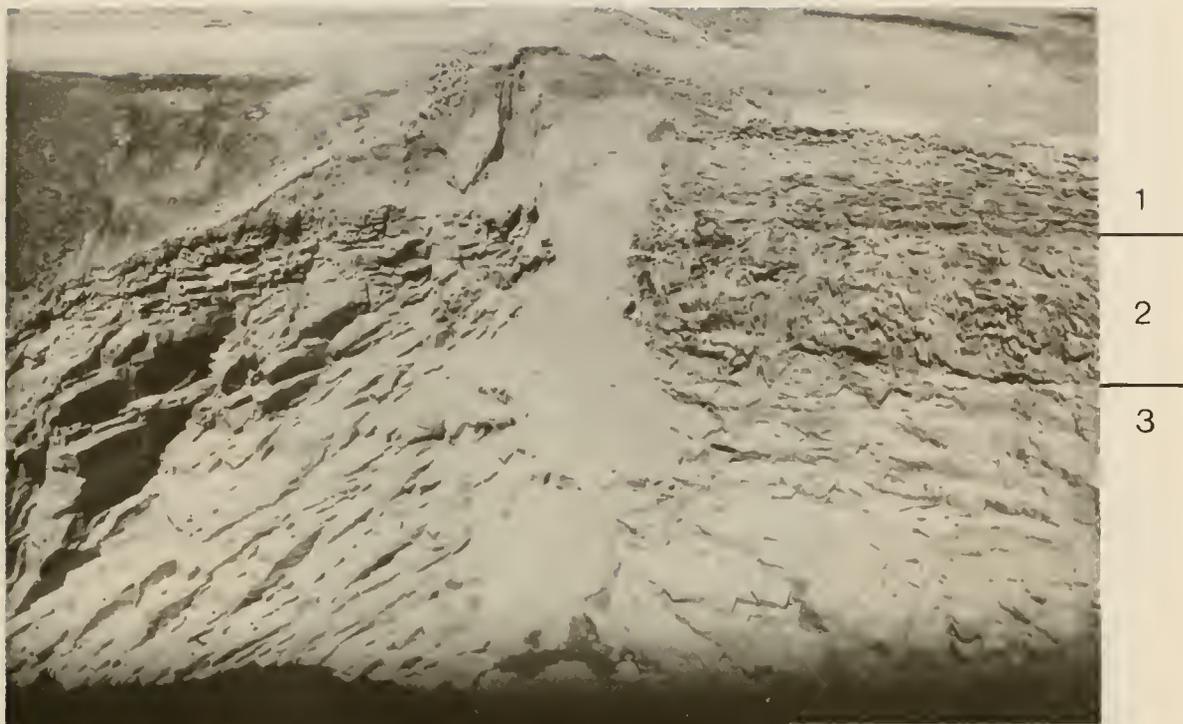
Aerial view of right abutment, Teton Dam, nearly perpendicular to the canyon wall. Note abrupt termination of unit 2 just downstream from the embankment remnant. View to northwest taken June 1976.
